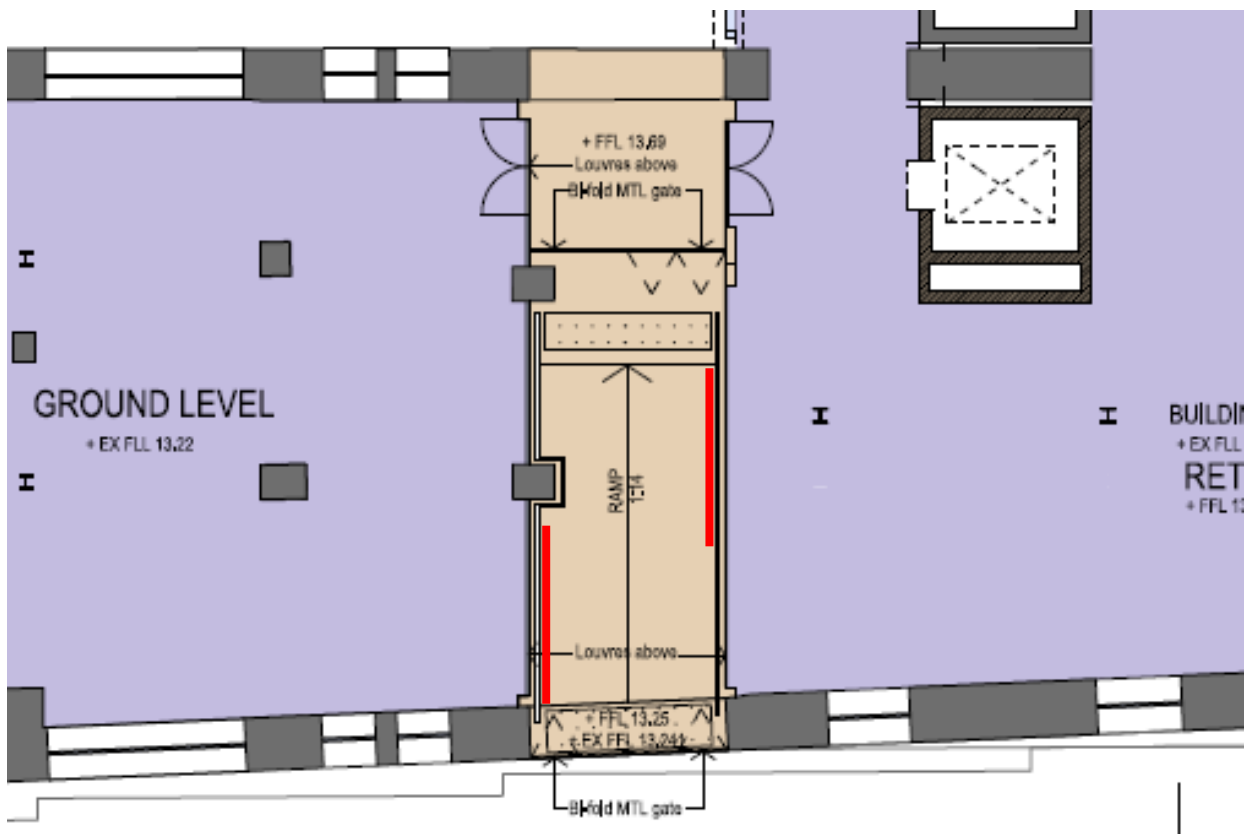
Part of ground floor plan illustrating in red potential location for worker's wall.
